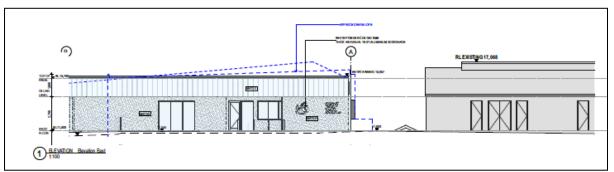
Proposed east elevation under DA-1321/2021/A which show the outline of the approved built form (in blue dotted line).
